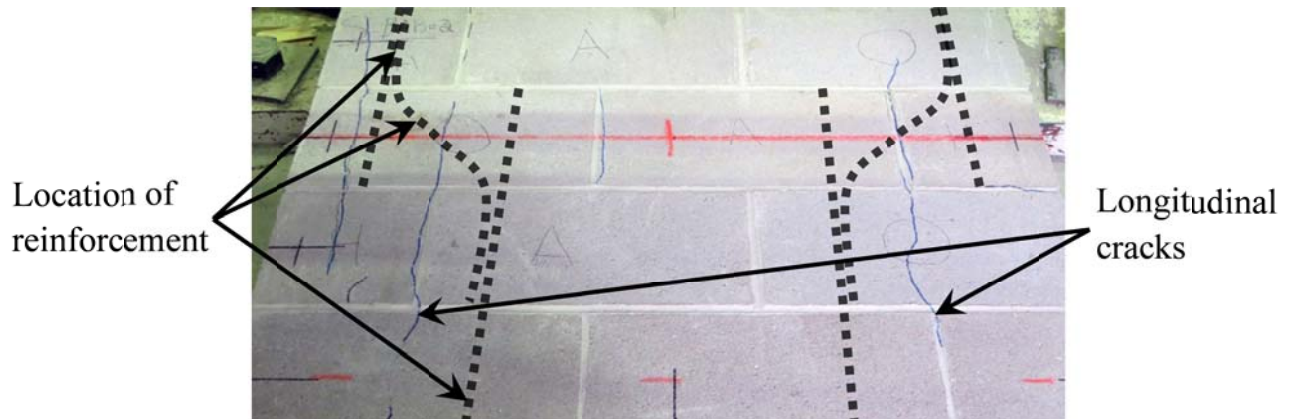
Longitudinal Cracks on the Compression Face of a Representative SBAR Wall Splice Specimen.
